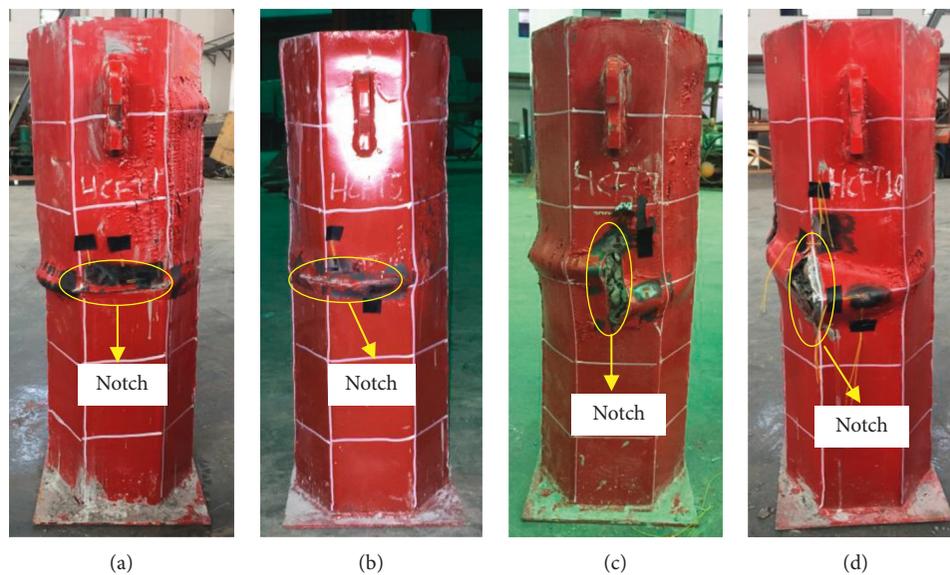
Failure modes for hexagonal CFST columns. (a) Horizontal notch in the sidewall. (b) Notch in the corner. (c) Vertical notch in the sidewall. (d) Vertical notch in the corner.
